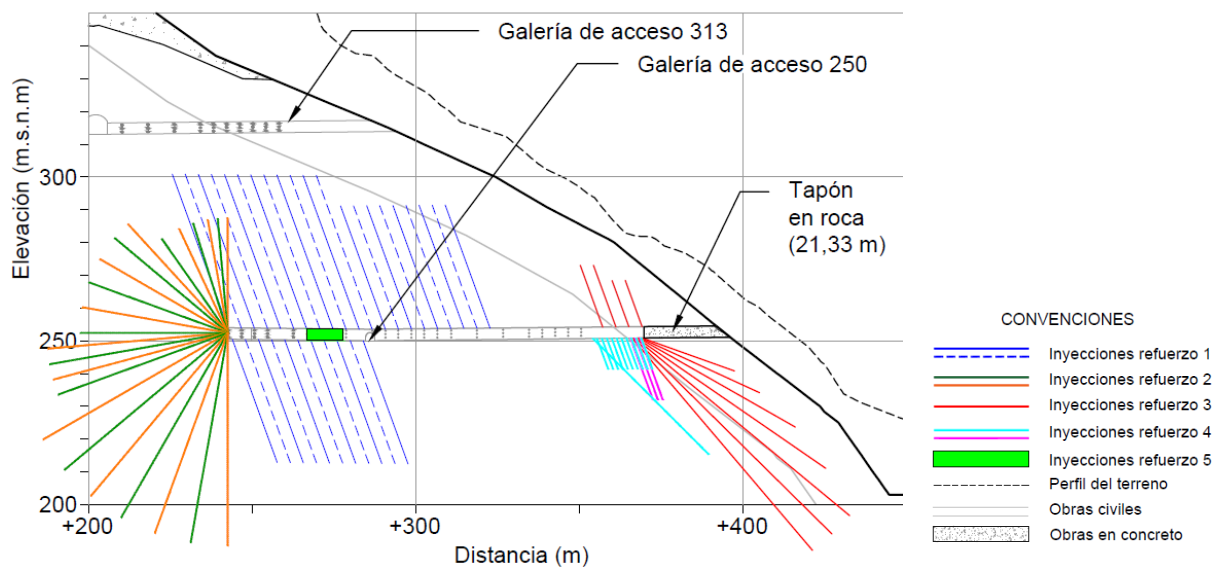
Additional grouting in the left abutment (From Integral 2019)
